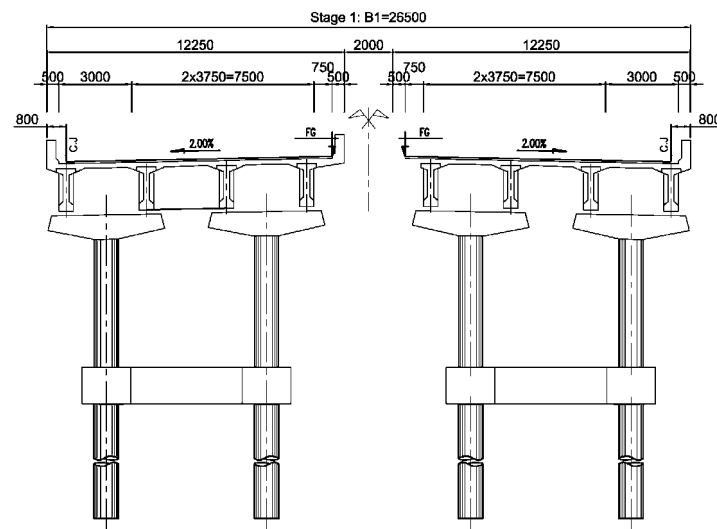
Viaduct, Short Span Bridge (PC I Girder L=33 m) Phase 1
